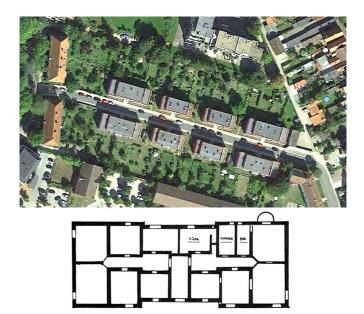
Otto Haesler, Siedlung Rothenberg in Kassel, 1930–31, floor plans and site plan.
